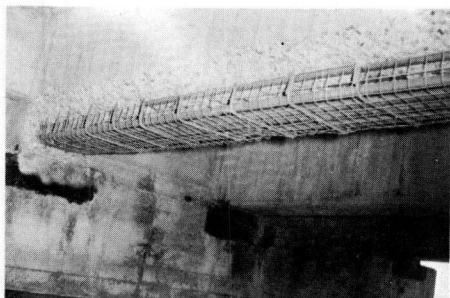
Beam bottom with stirrups replaced and wire mesh in place, ready for shotcrete.
